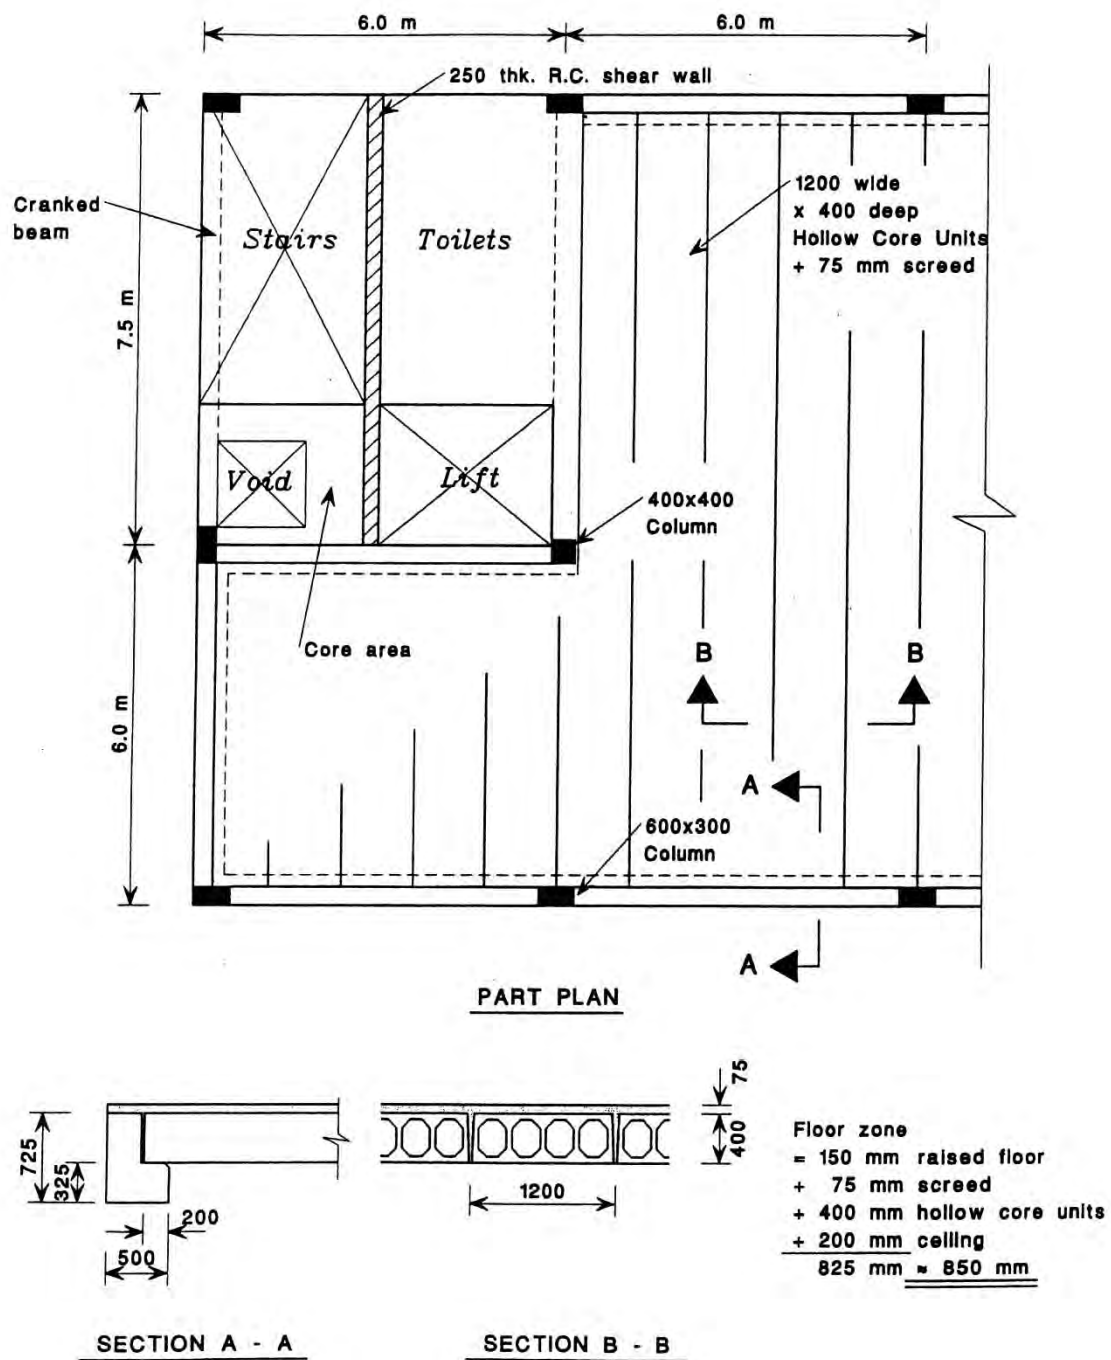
Pre-cast hollow core units on reinforced concrete edge beams (SCI 2004)
